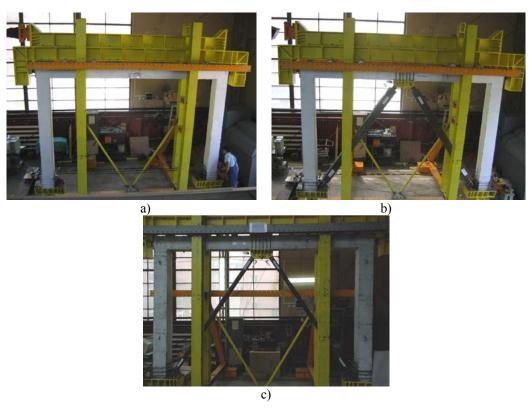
Test set-up: a) initial RC frame without strengthening; b) RC frame strengthened with BRB; c) RC frame strengthened with CBS
